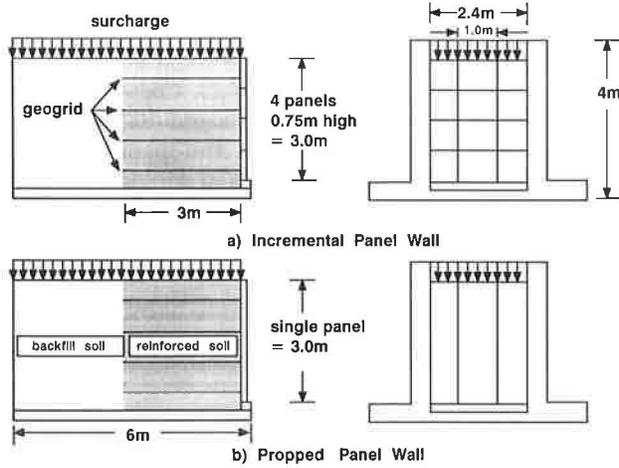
Typical test configurations: (a) incremental panel wall; (b) propped panel wall.
